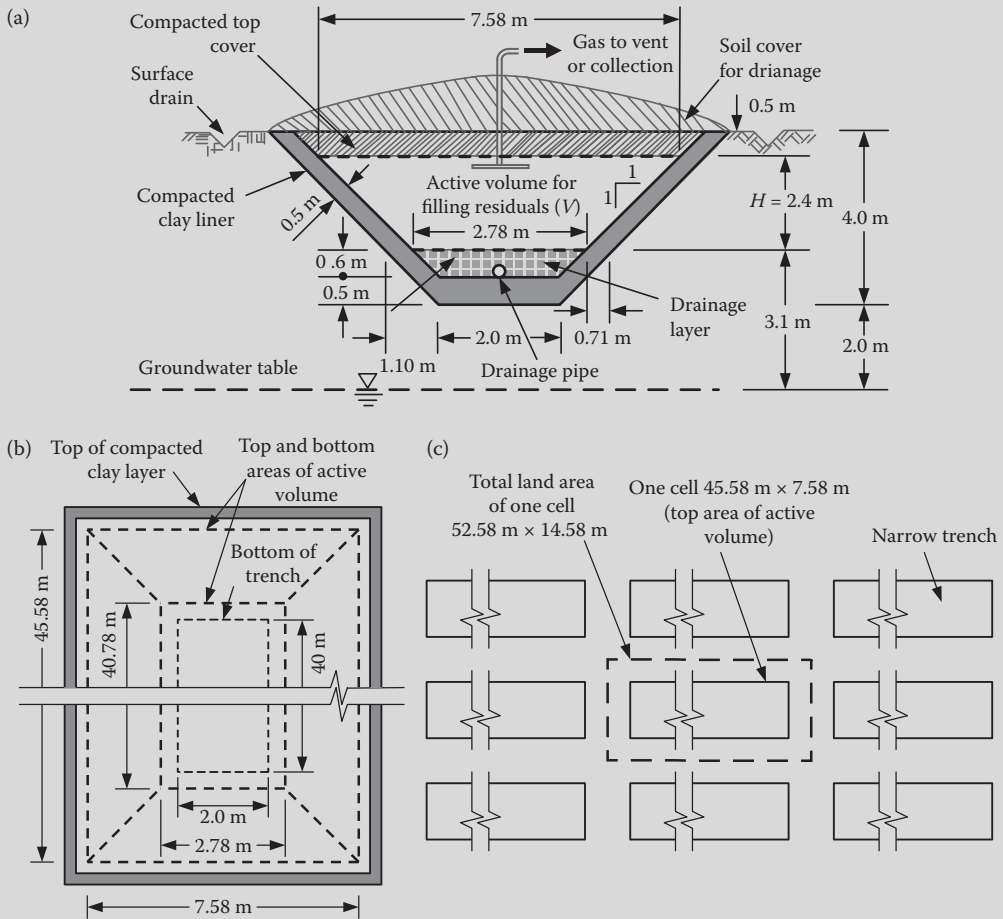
Design details and layout of narrow trench sludge landfill: (a) cross section, (b) plan of a single cell, and (c) layout plan and outer boundary of a cell in a cluster of trenches (Example 13.76).
